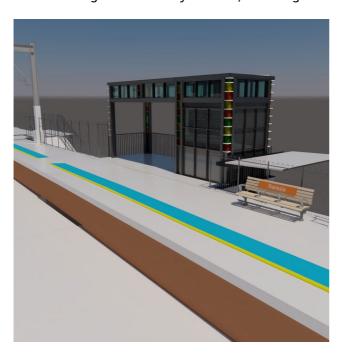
Lift 1 structure and canopy on Platform 1; facing southwest
